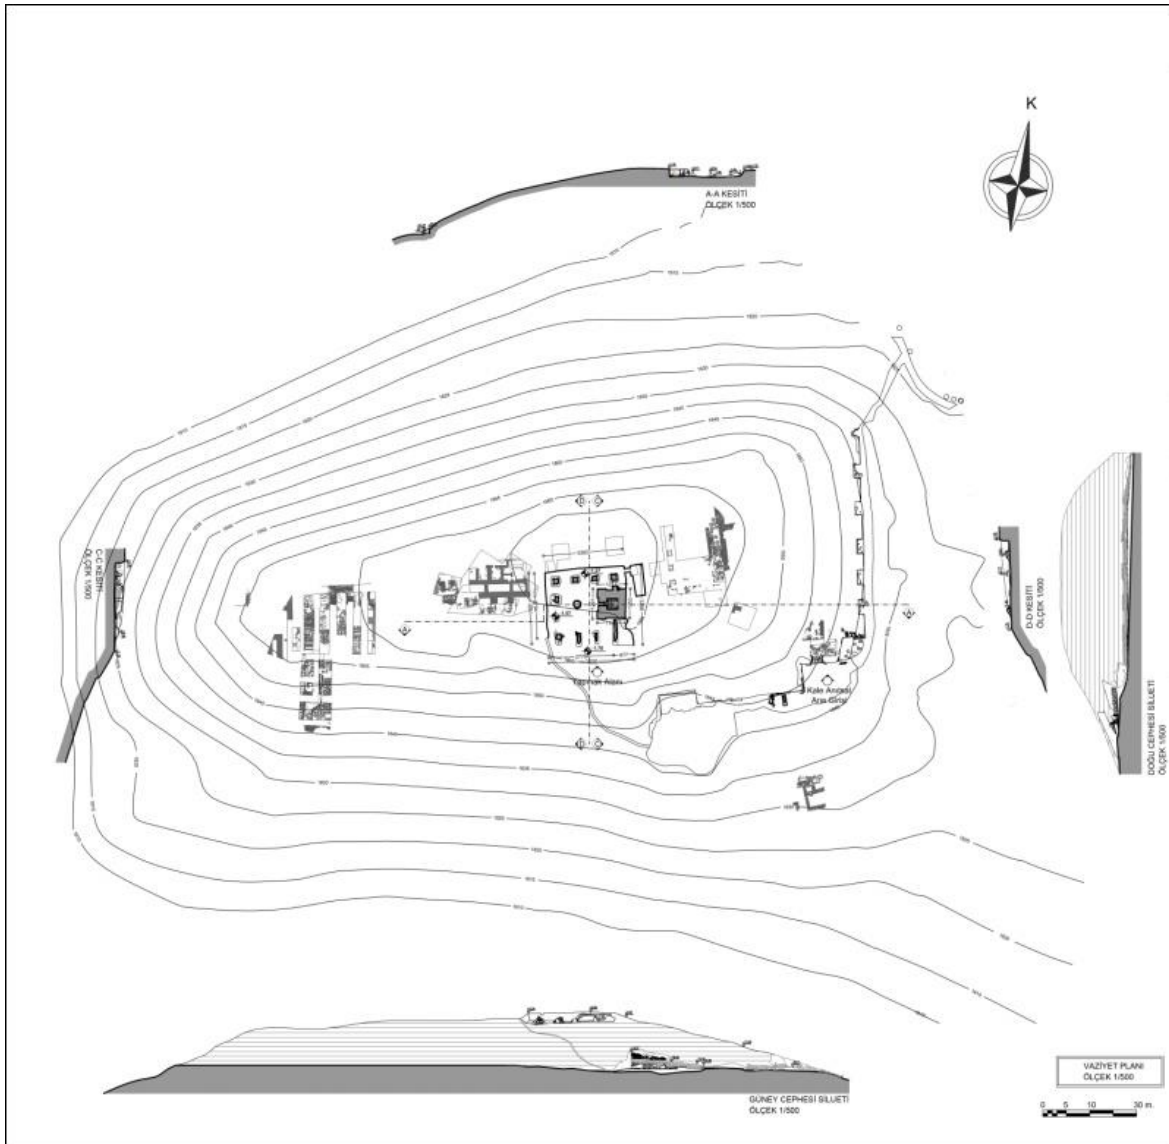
Temple area plan Section and Façade (drawing in 1913).
